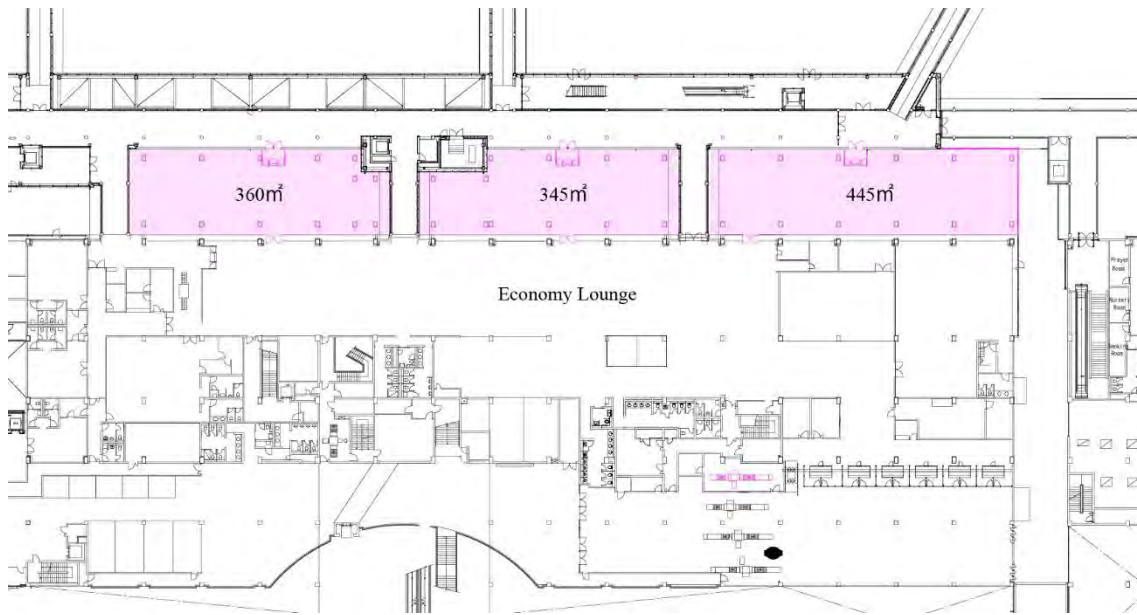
Improvement Plan of Departure Lounge in International Passenger Terminal
